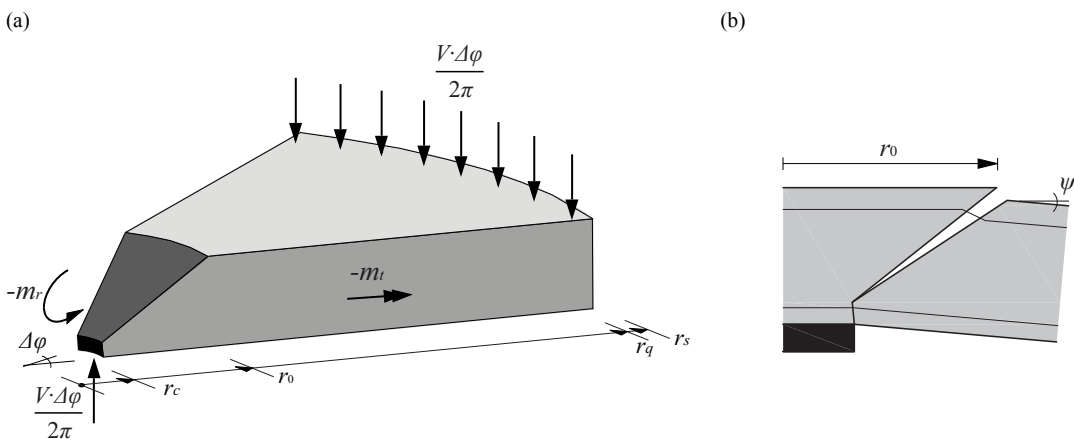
Assumed slab kinematic: (a) outer slab segment with acting forces and (b) deformed shape of the slab at the column vicinity
